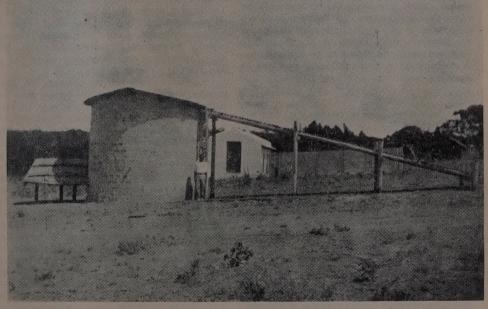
Maize bin, 30 ton size, at the Iheme Experimental Farm, Iringa, with loading ramp and bagging pit.
